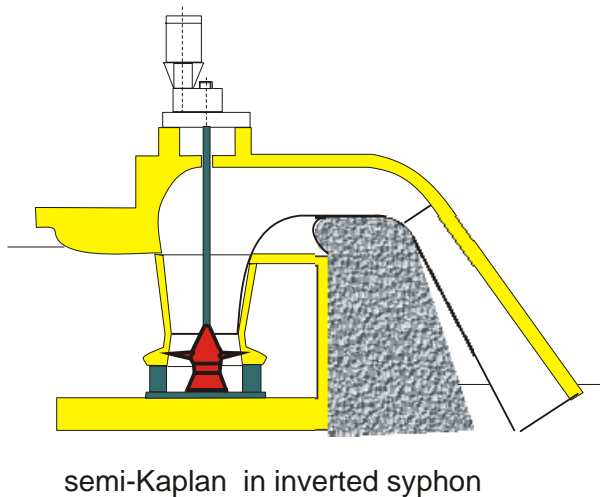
Cross section of a Kaplan inverse siphon power plant
